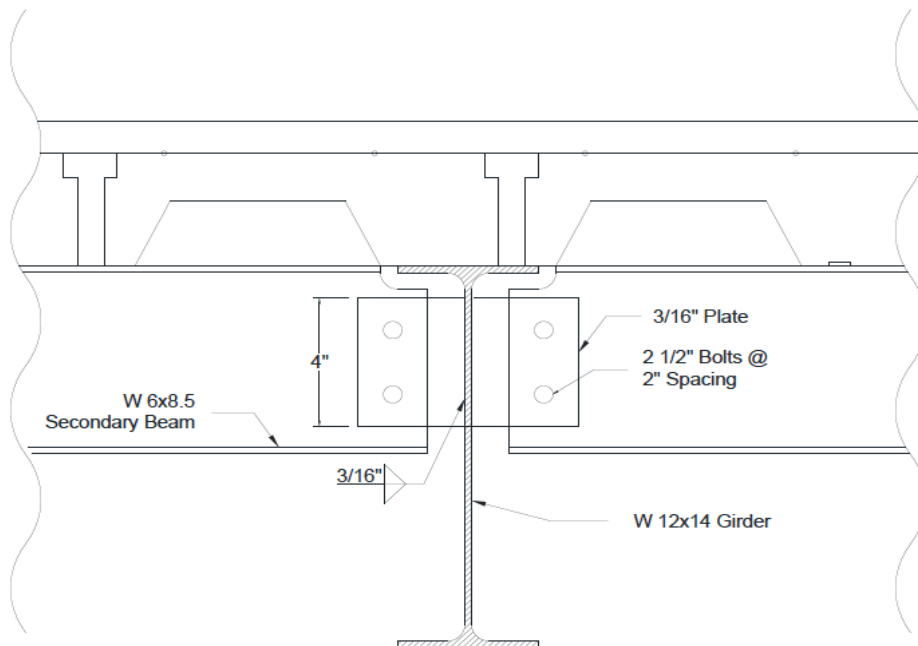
Secondary Beam-to-Girder Shear Tab Connection
